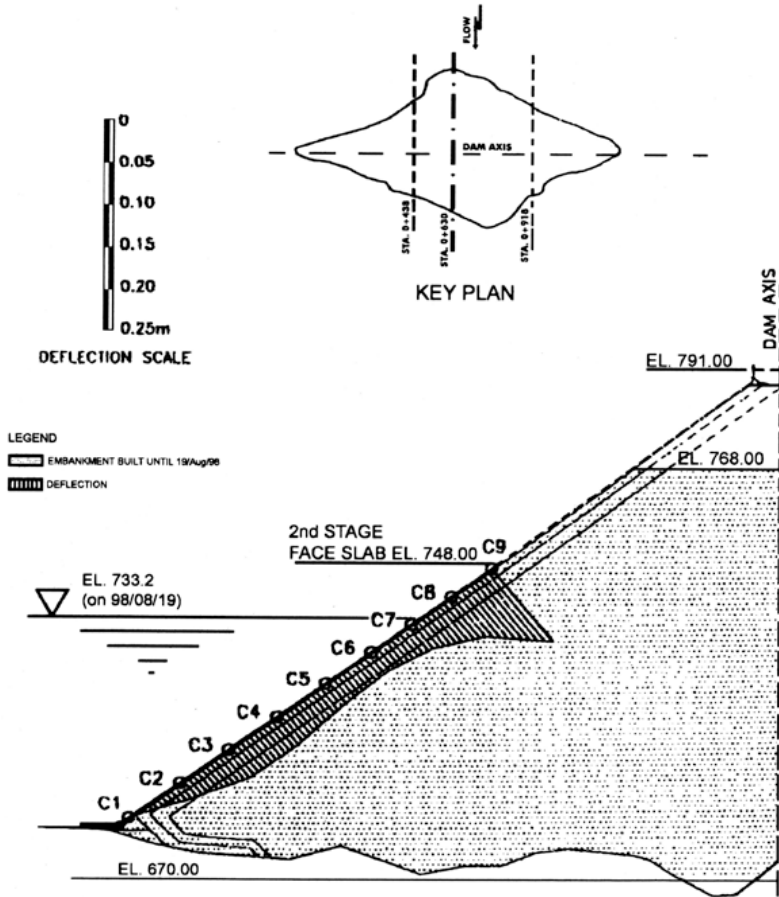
Tianshengqiao dam. Deflection of 2nd stage slab on section C.
